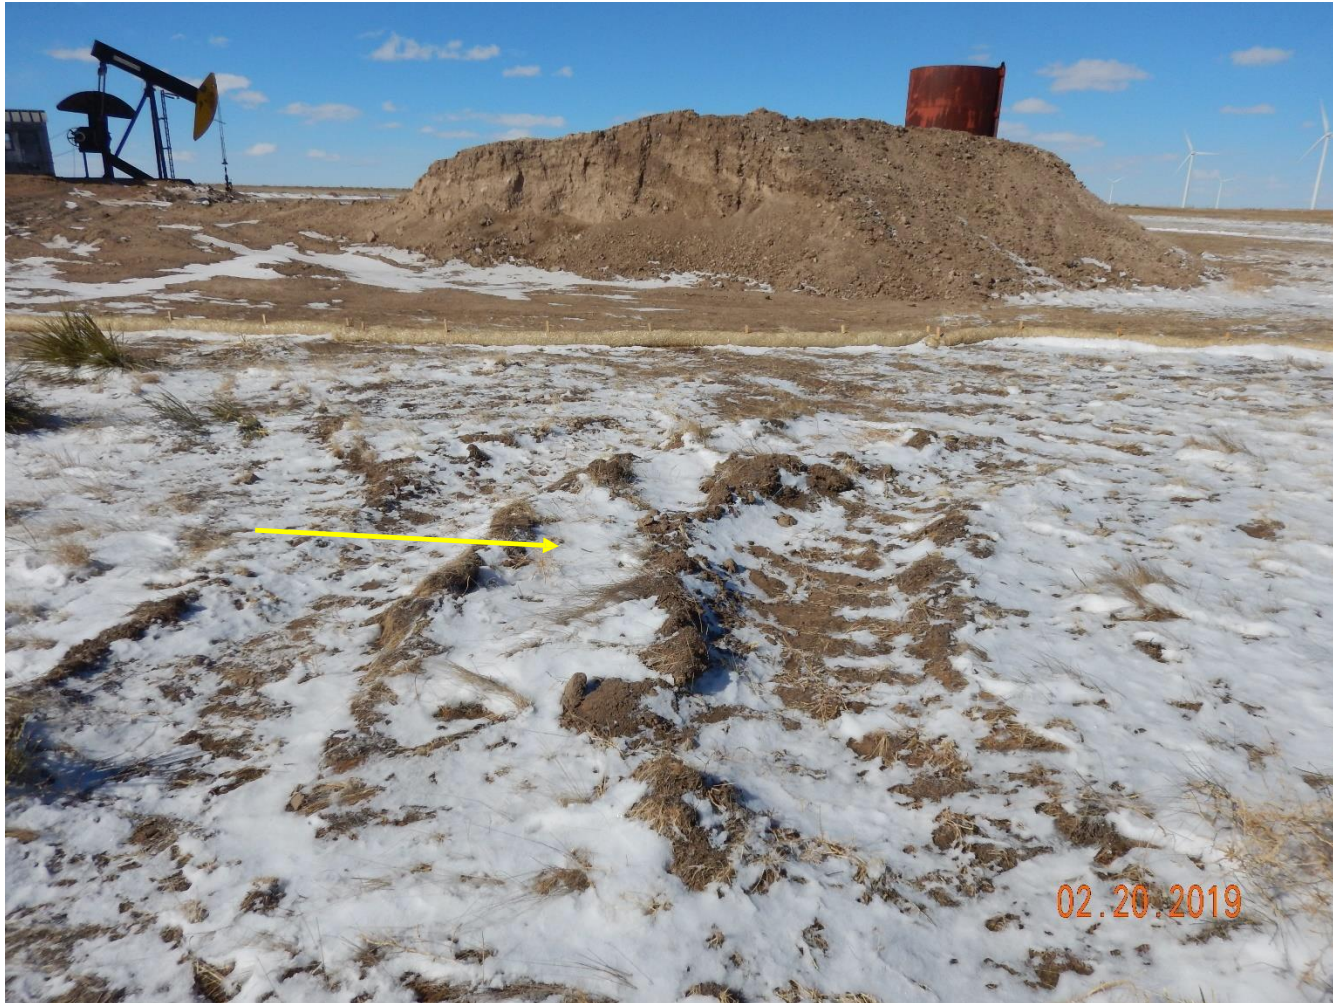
Photo taken from the southeast of the pit soil stockpile, facing northwest. See comments under photo 9. Photo also shows additional disturbances beyond location.
